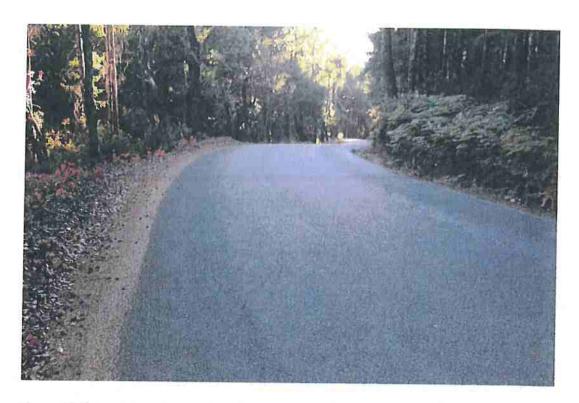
Mile 1.5: 20-ft road width with 1-ft shoulders.
